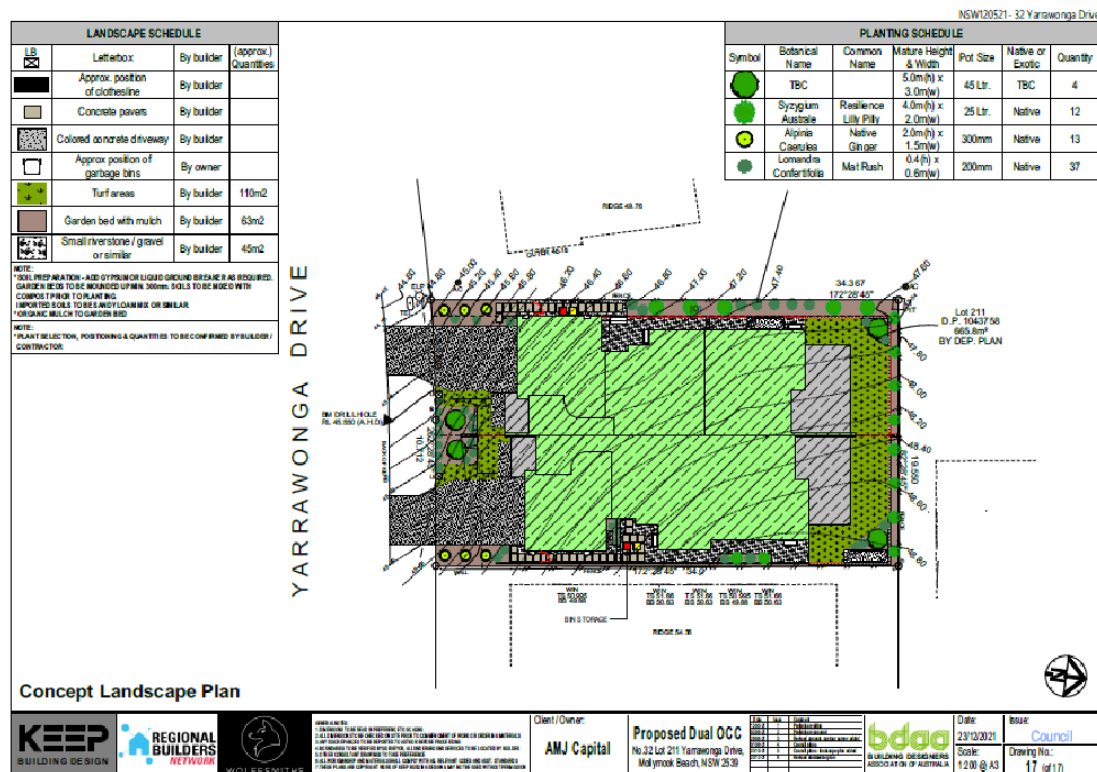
Landscape Plan - 32 Yarrowonga Dr, Mollymook Beach
